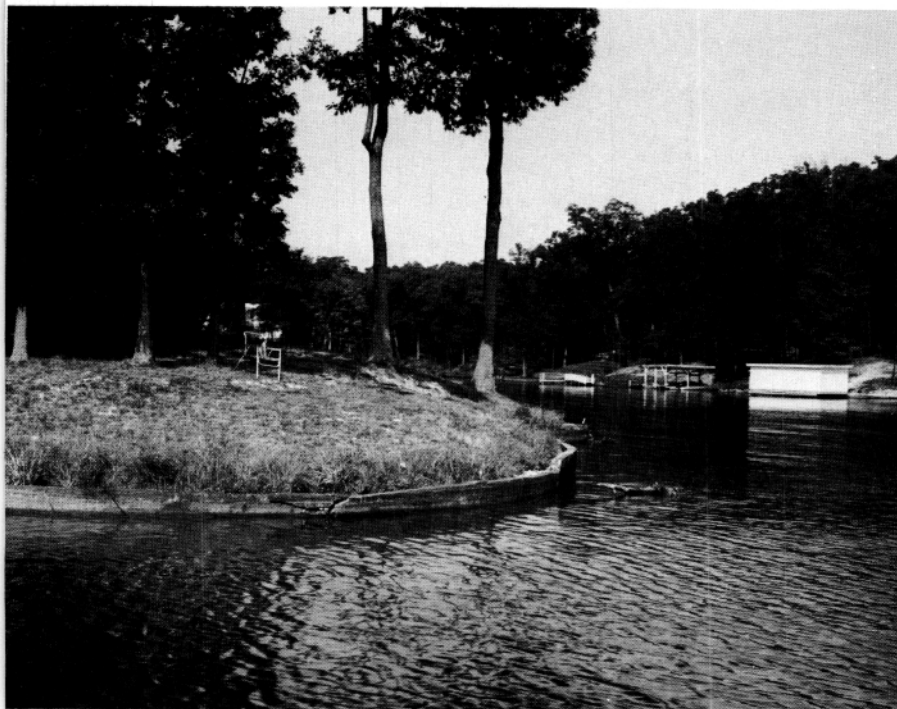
Wall failure where reinforcing rods were omitted.
